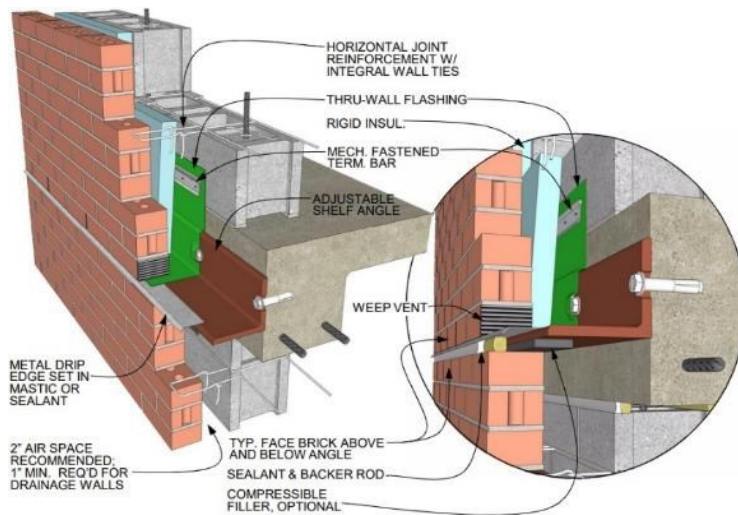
Shelf angle detail in cavity wall (International Masonry Institute).
